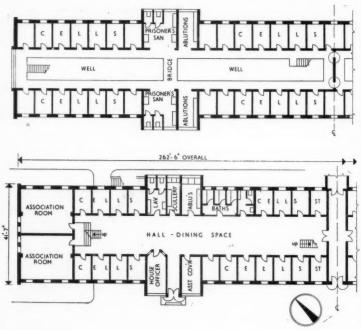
Plan of the cell blocks at Everthorpe, each of which has two wings, handed. Above, ground floor plan; top first and second floors [Scale: 1" = 1 0"]
